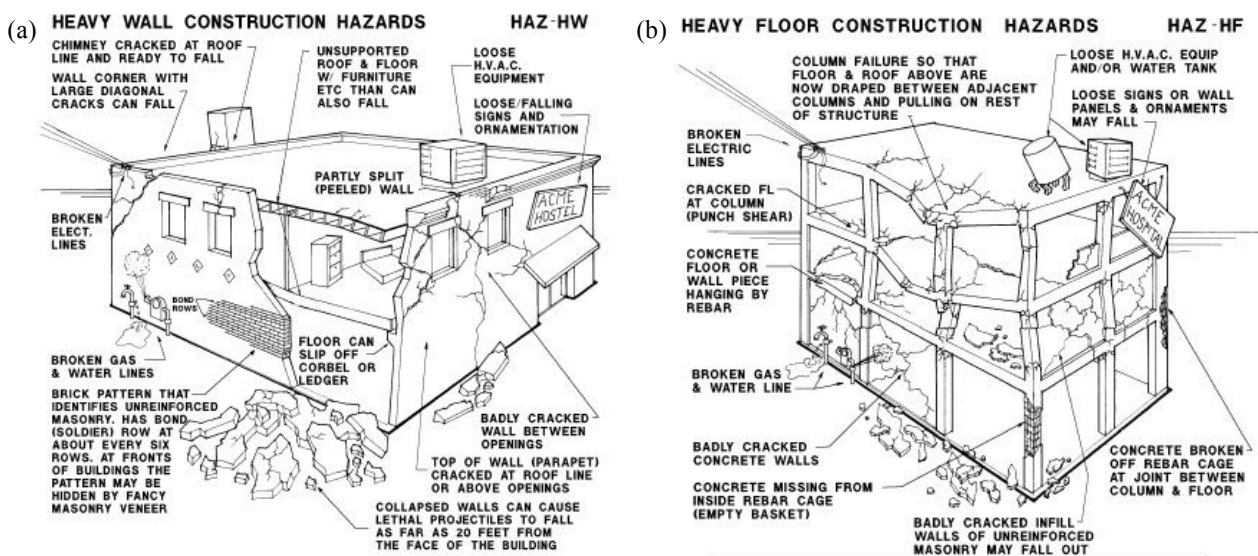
Example of diagrams contained within the *Structural Collapse Technician Manual* (a) A typical masonry building structure [10] (b) A typical reinforced concrete frame building structure [10].
